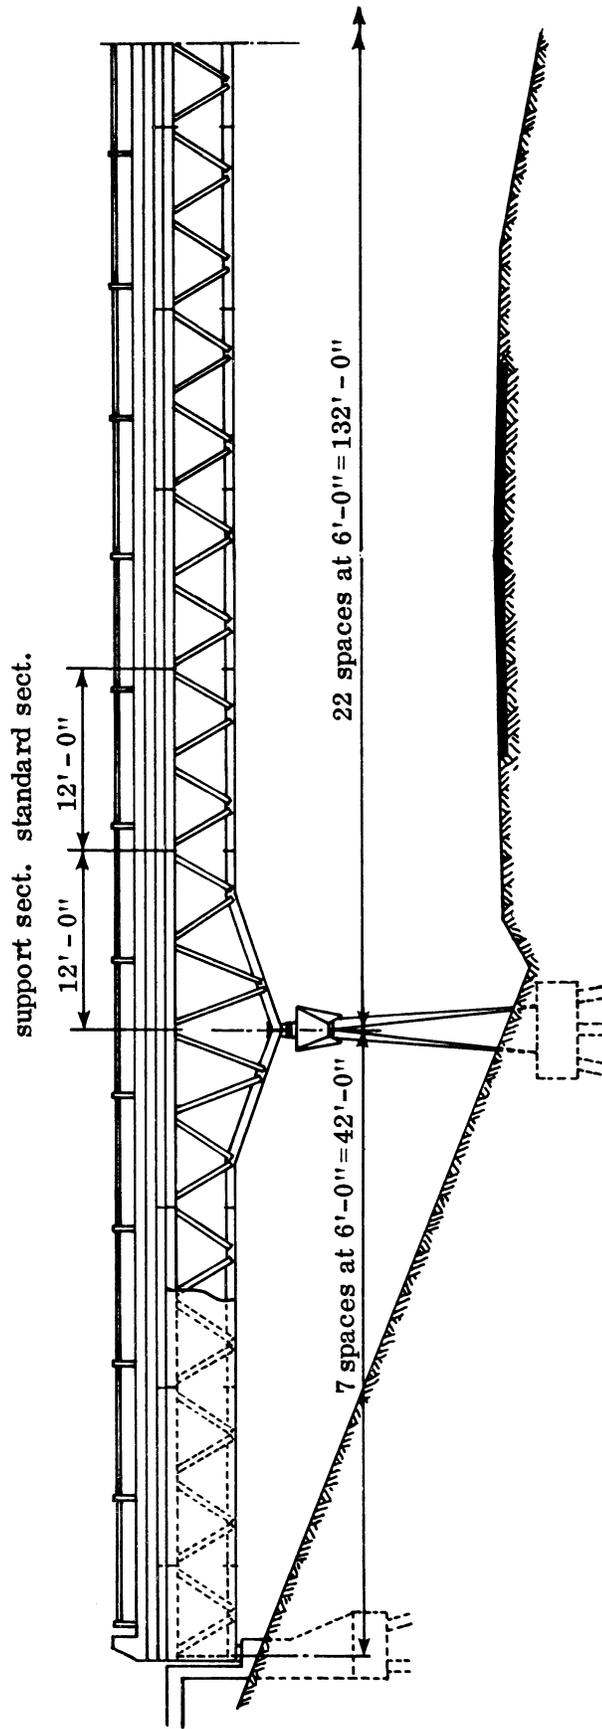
Revised space frame design with standard 12' - 0" (3.66 m) sections
